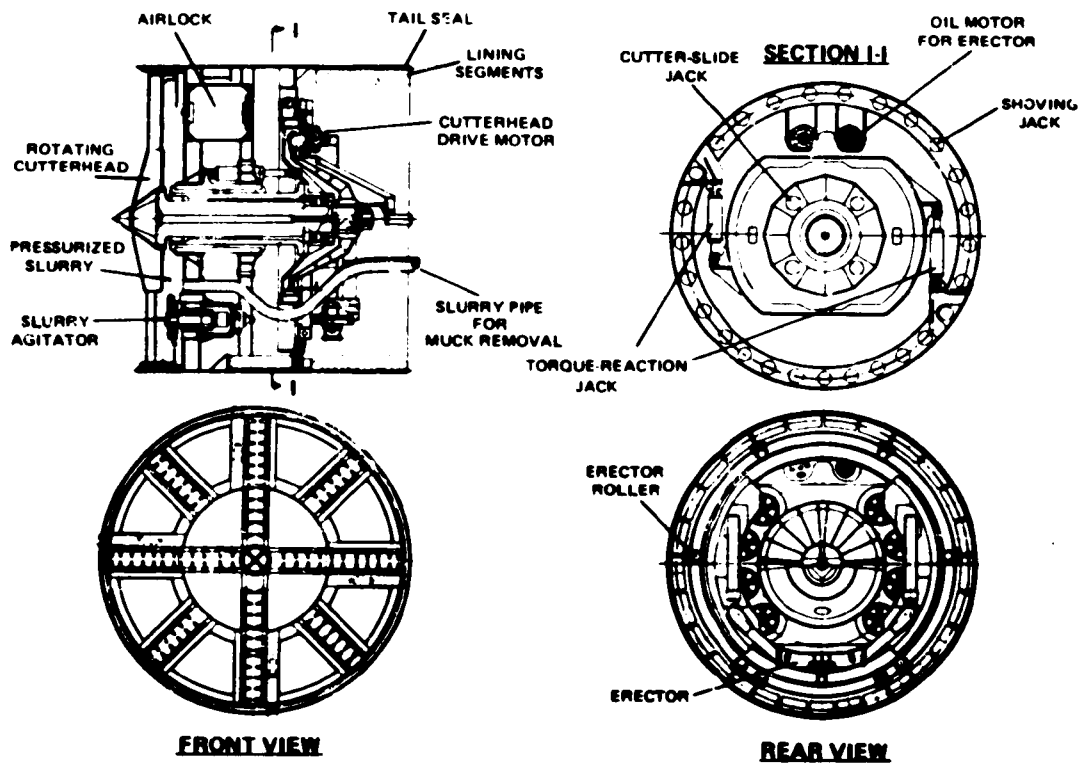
Tunneling Machine with Pressurized Slurry-Face
